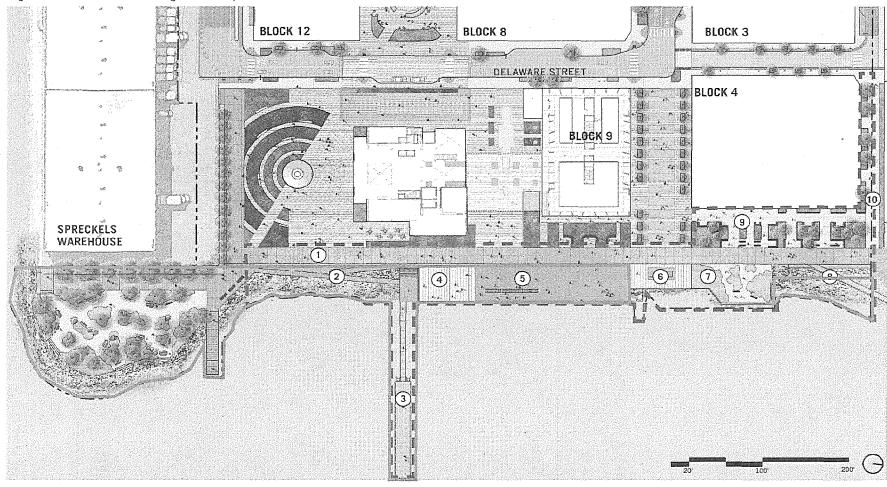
Waterfront Open Spaces: Concept Plan Overview BLOCK 12 BLOCK 3 BLOCK 8 DELAWARE STREET BLOCK 4 4 SPRECKELS WAREHOUSE WATERFRONT OPEN SPACES (4) Block 9 Open Spaces 4.22-423 1 Waterfront Park: Section 4.19 Concept Plan Overview (5) Humboldt Street Plaza: Section 4.24 2) The Point: Section 4.20
